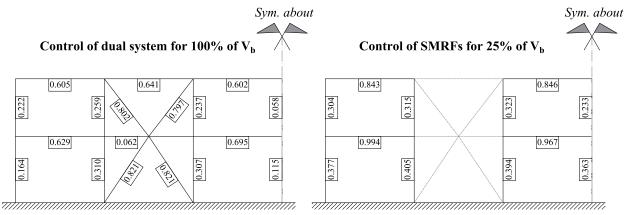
The P-M ratio of designed cross-sections of 2-Story building archetype
